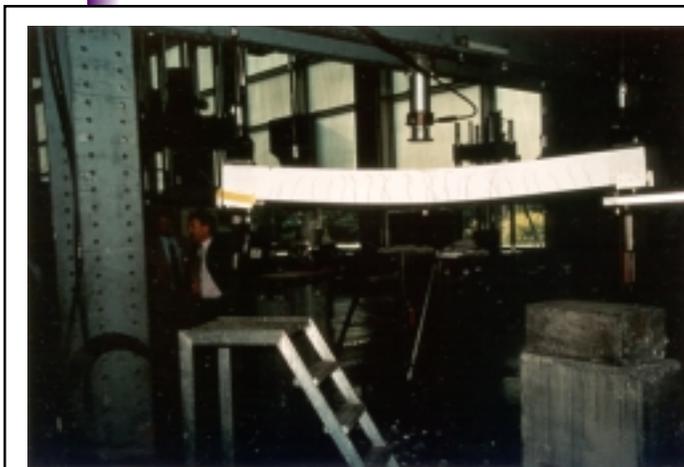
Fiber-reinforced concrete slab test at Swiss Federal Institute of Technology (ETH).
